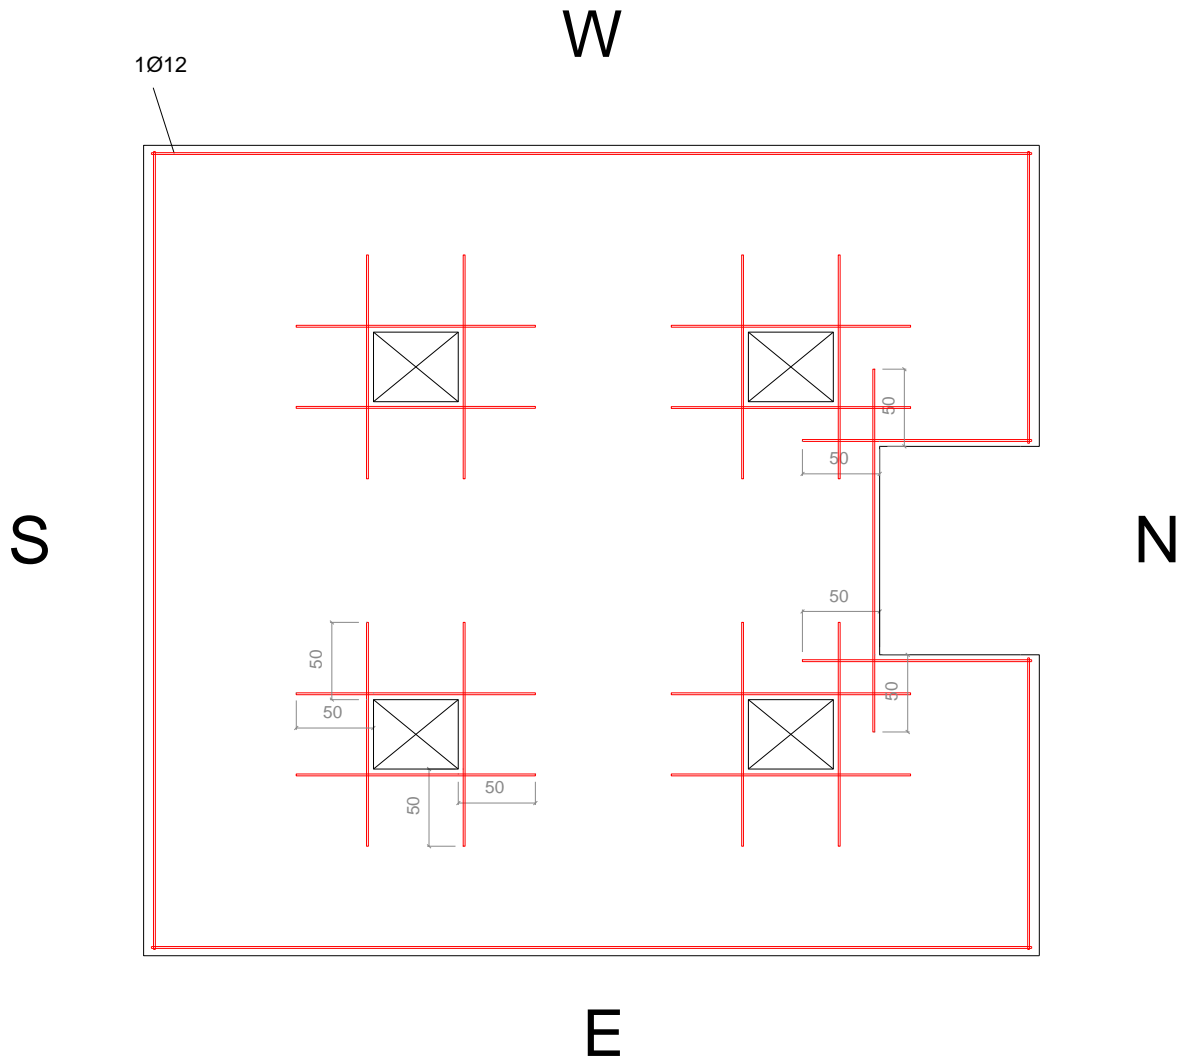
Reinforced concrete slab: perimeter reinforcement plan view. Units of cm.
